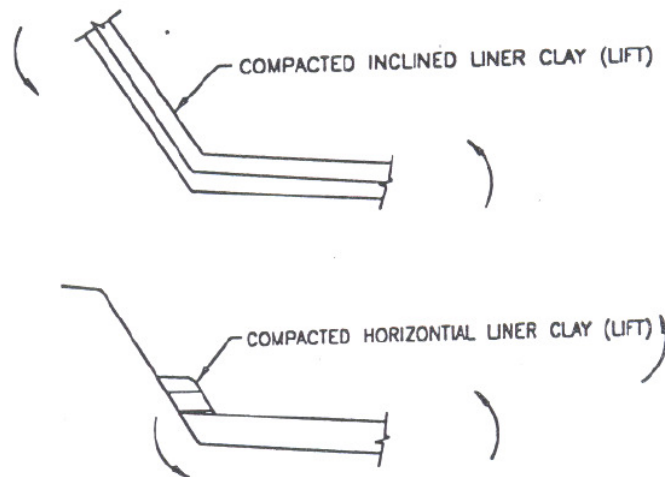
Construction of Inclined and Horizontal Side Slope Liners
